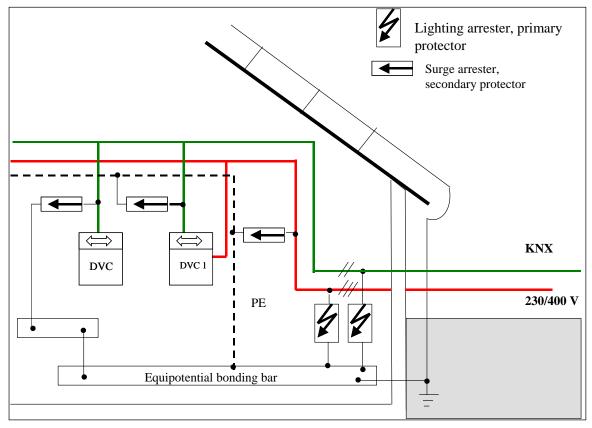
Primary and secondary protection –bus connection with other building – KNX not installed in metal channels or pipes
